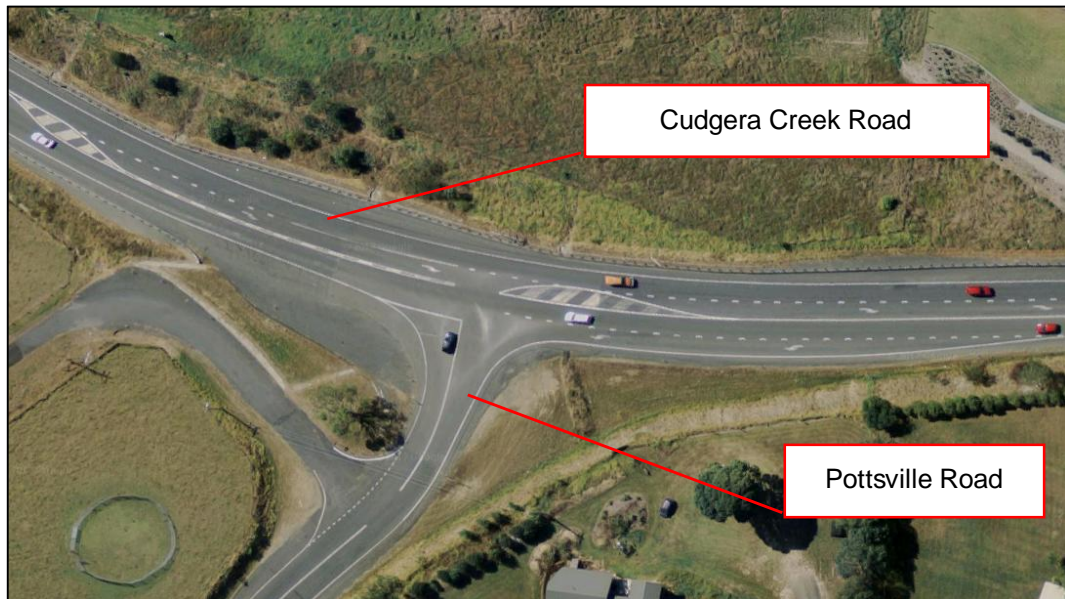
Pottsville Road/Cudgera Creek Road intersection
